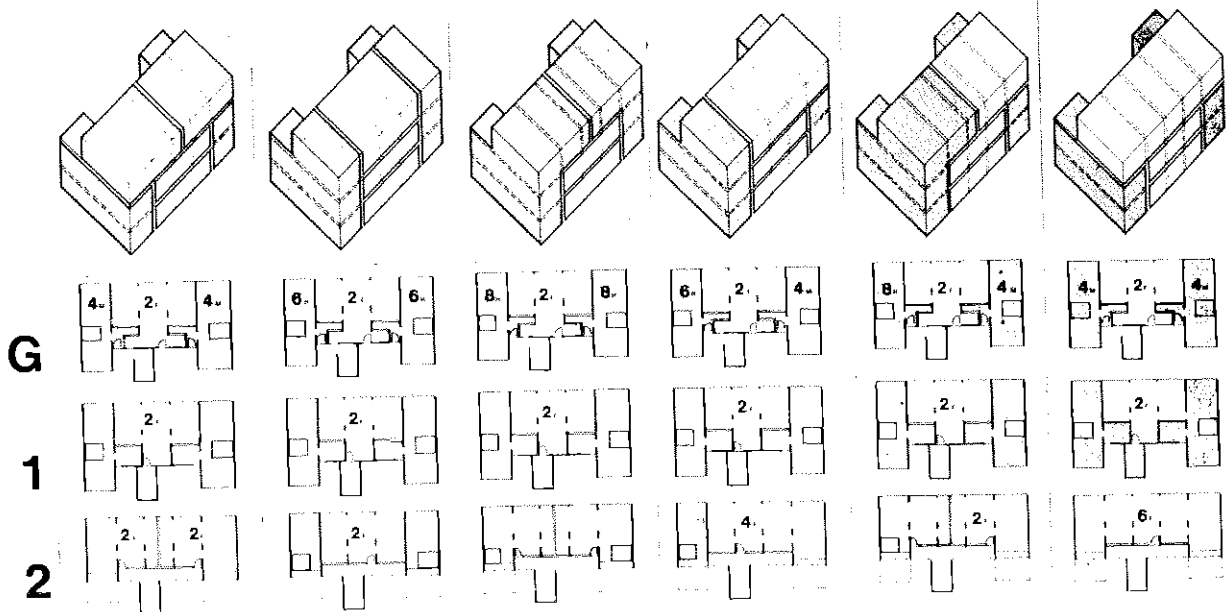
Sketches and plans showing alternative dwelling size possibilities within the standard three storey block.
